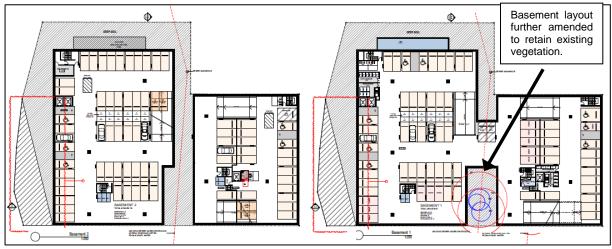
Extract of the amended basement plan presented to the DEP meeting on 17 March 2016.
